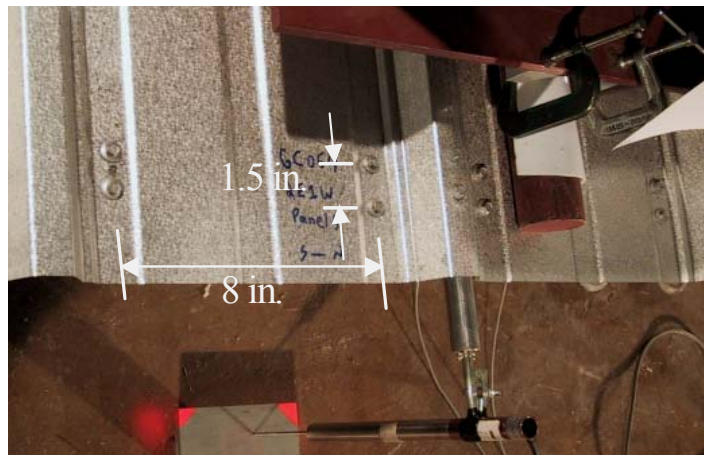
Selected standard panel-to-section and panel-to-panel fastener configuration (C-section)
